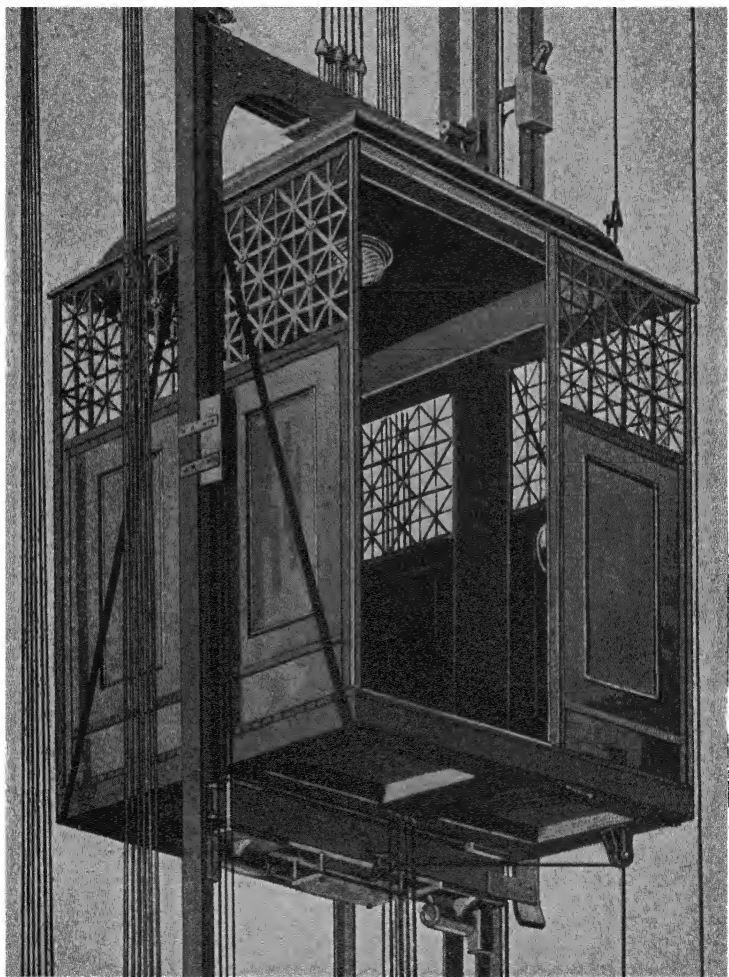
Details of Arrangement of Passenger-Elevator Car
